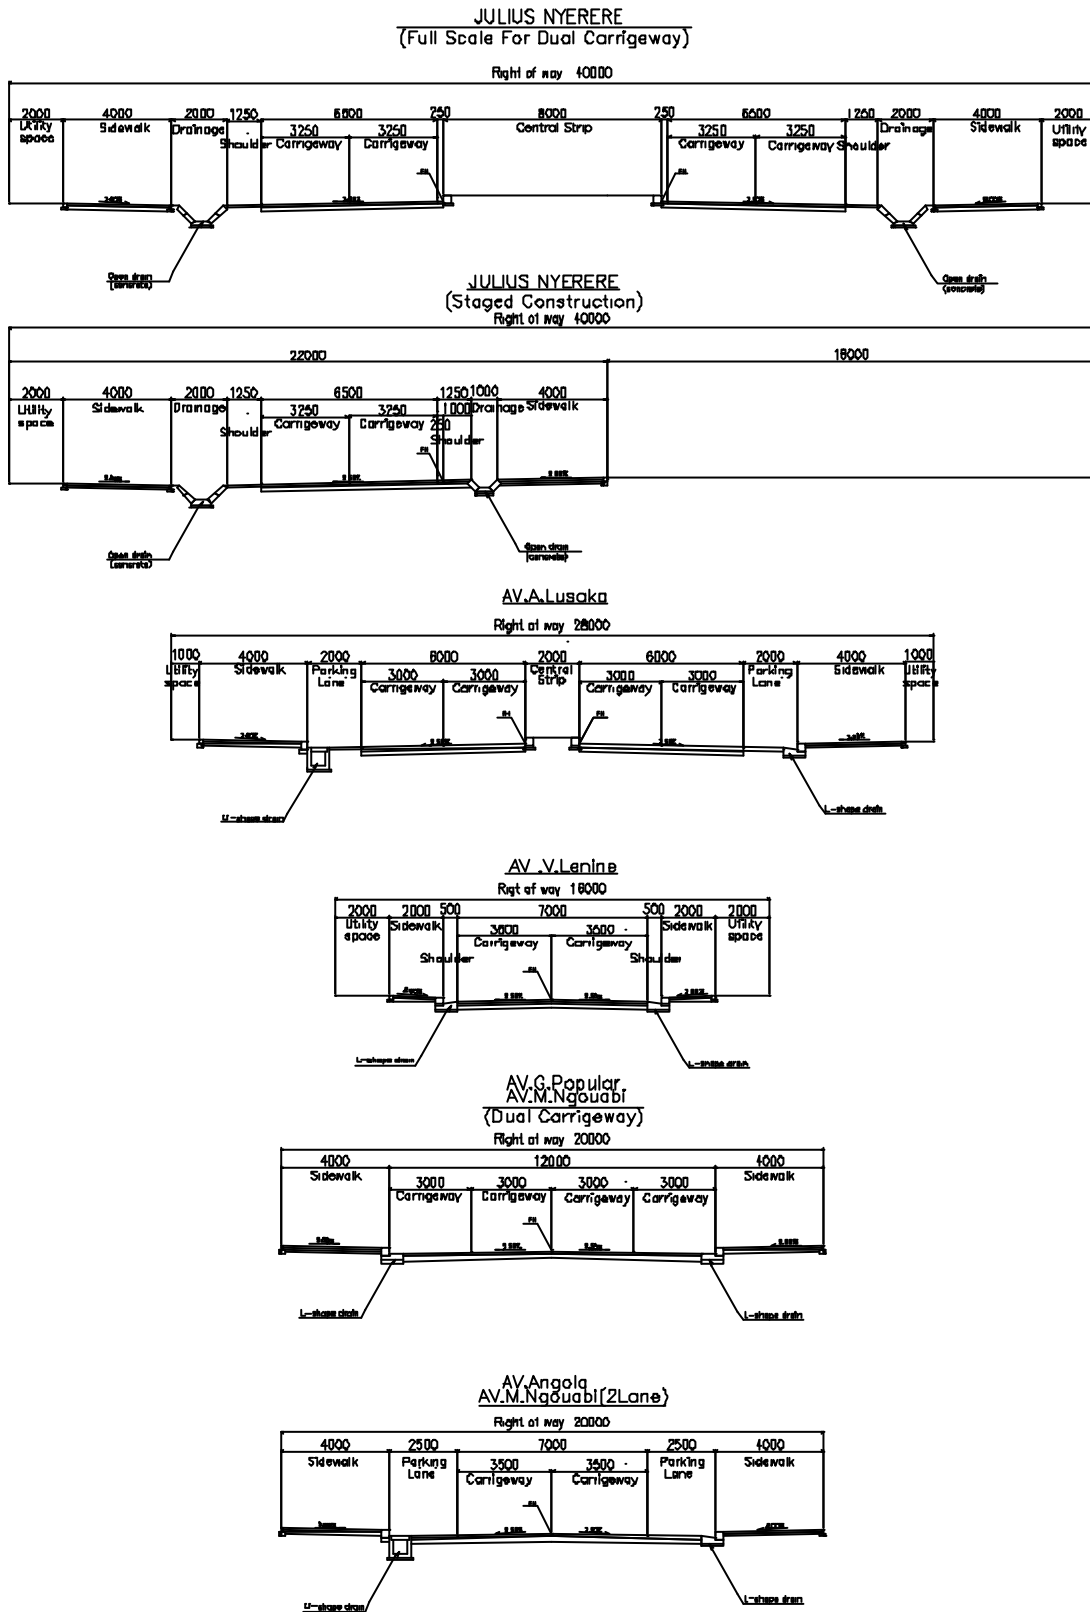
(1) Proposed Typical Cross-sections (Trunk Roads)
